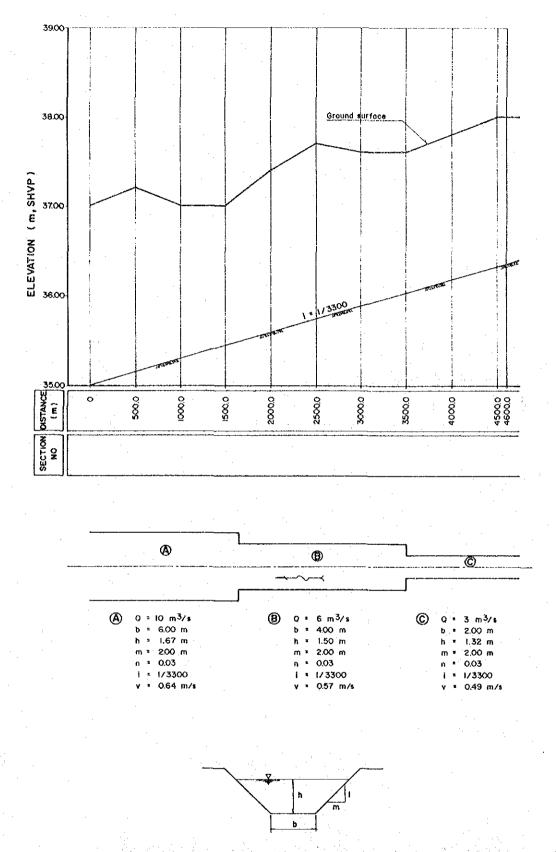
LONGITUDINAL PROFILE AND STANDARD CROSS - SECTION OF DRAINAGE CANAL FROM SIDE OVERFLOW DIKE TO DRAINAGE SLUICE OF RIGHT WIDAS RETARDING BASIN (2/3)
